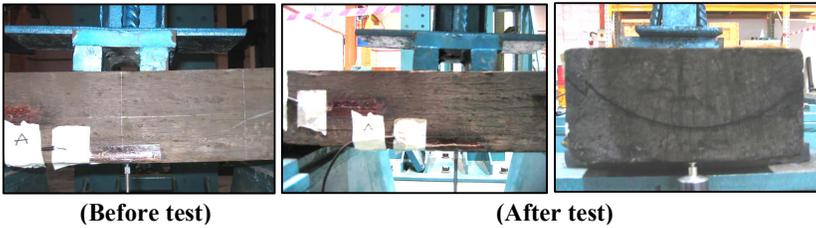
Crack Patterns for TRSP1- Tangential Crack.
